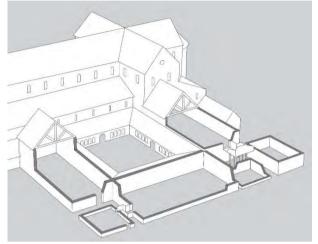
St. Gall Plan, isometric reconstruction (after Horn and Born, 1979, vol. 1, fig. 192).
